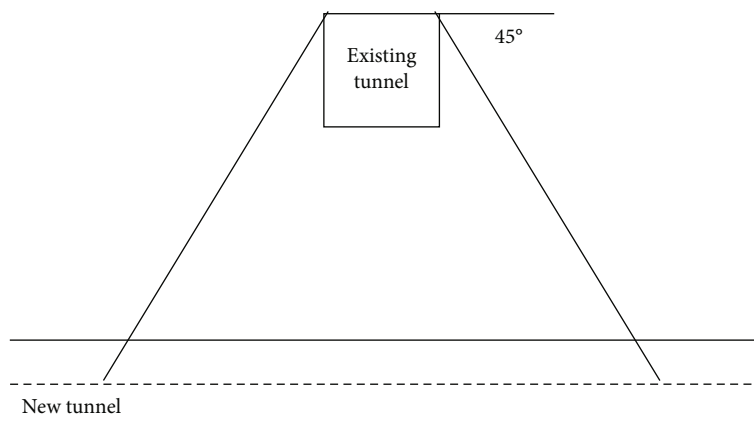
Construction scope of new tunnels affecting the existing tunnels.
